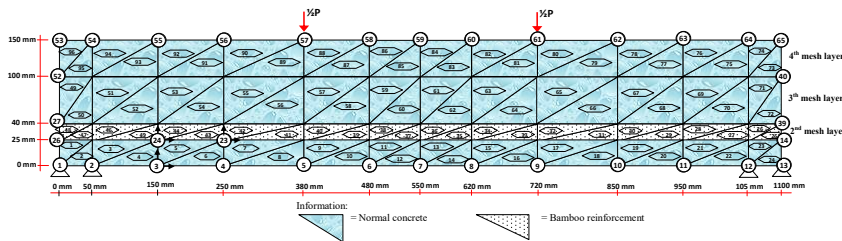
Discretization of the triangular element on the bamboo reinforced concrete (BRC) beam.
